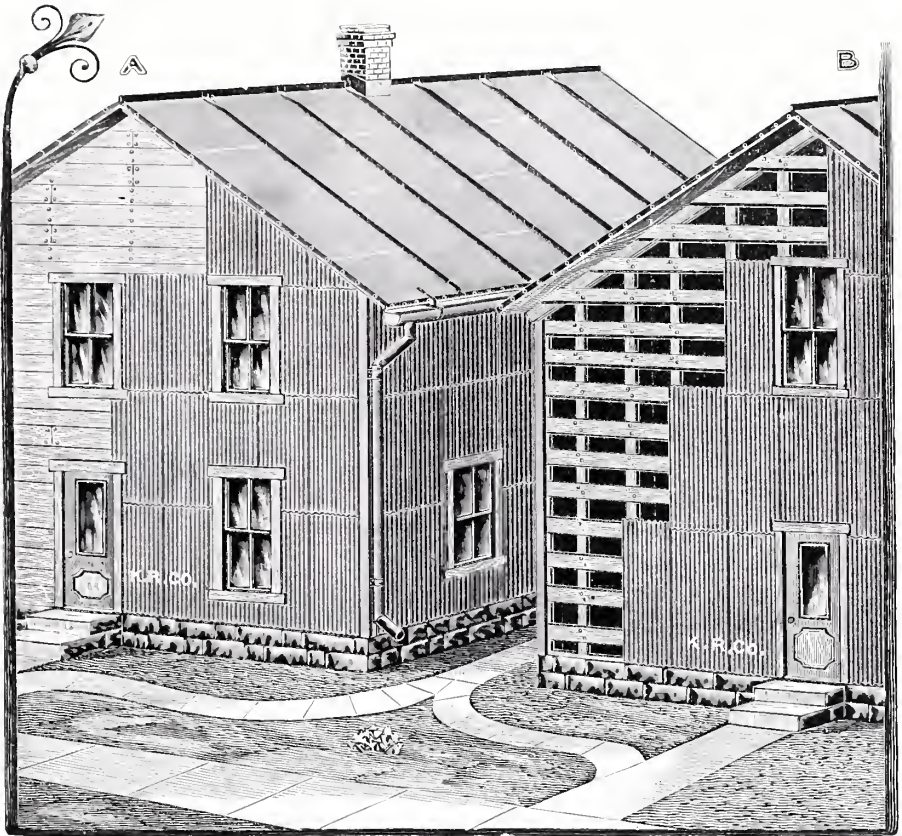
shows our Folded Lock Seam Steel Roofing in place, and the application of our corrugated siding, (A) to sheathing boards, (B) to lath nailed across the studding. Use sheets of $1\frac{1}{4}$ inch or 2 inch corrugations. Commencing at bottom lap one corrugation at side, (see Fig. 15) running first course across, put the second course on in the same manner, lapping ends of sheets one to two inches over first course. Nail through the side laps on top the corrugations and the end laps between the corrugations.
